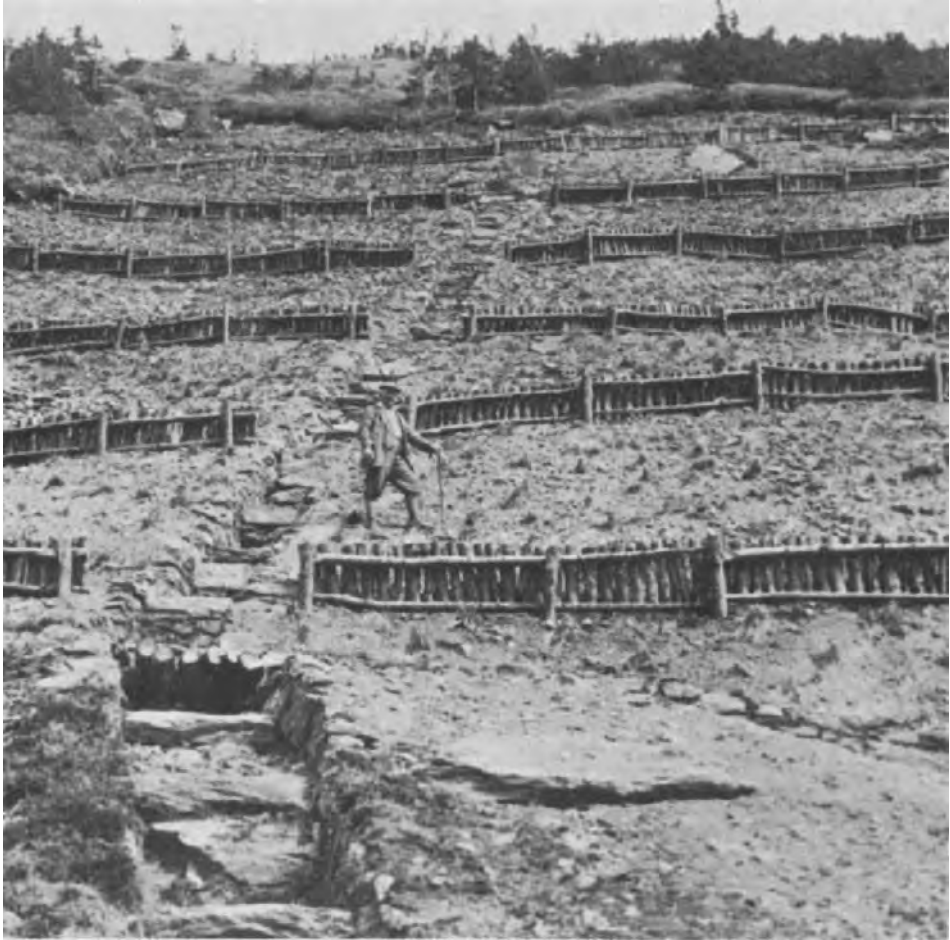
Soil stabilization on a shallow ravine using palisade fences. Water is diverted by a stone pavement. After stabilization, the area was planted with trees (Jeseník Mts, Czechoslovakia). (The author's collection of photographs.)
